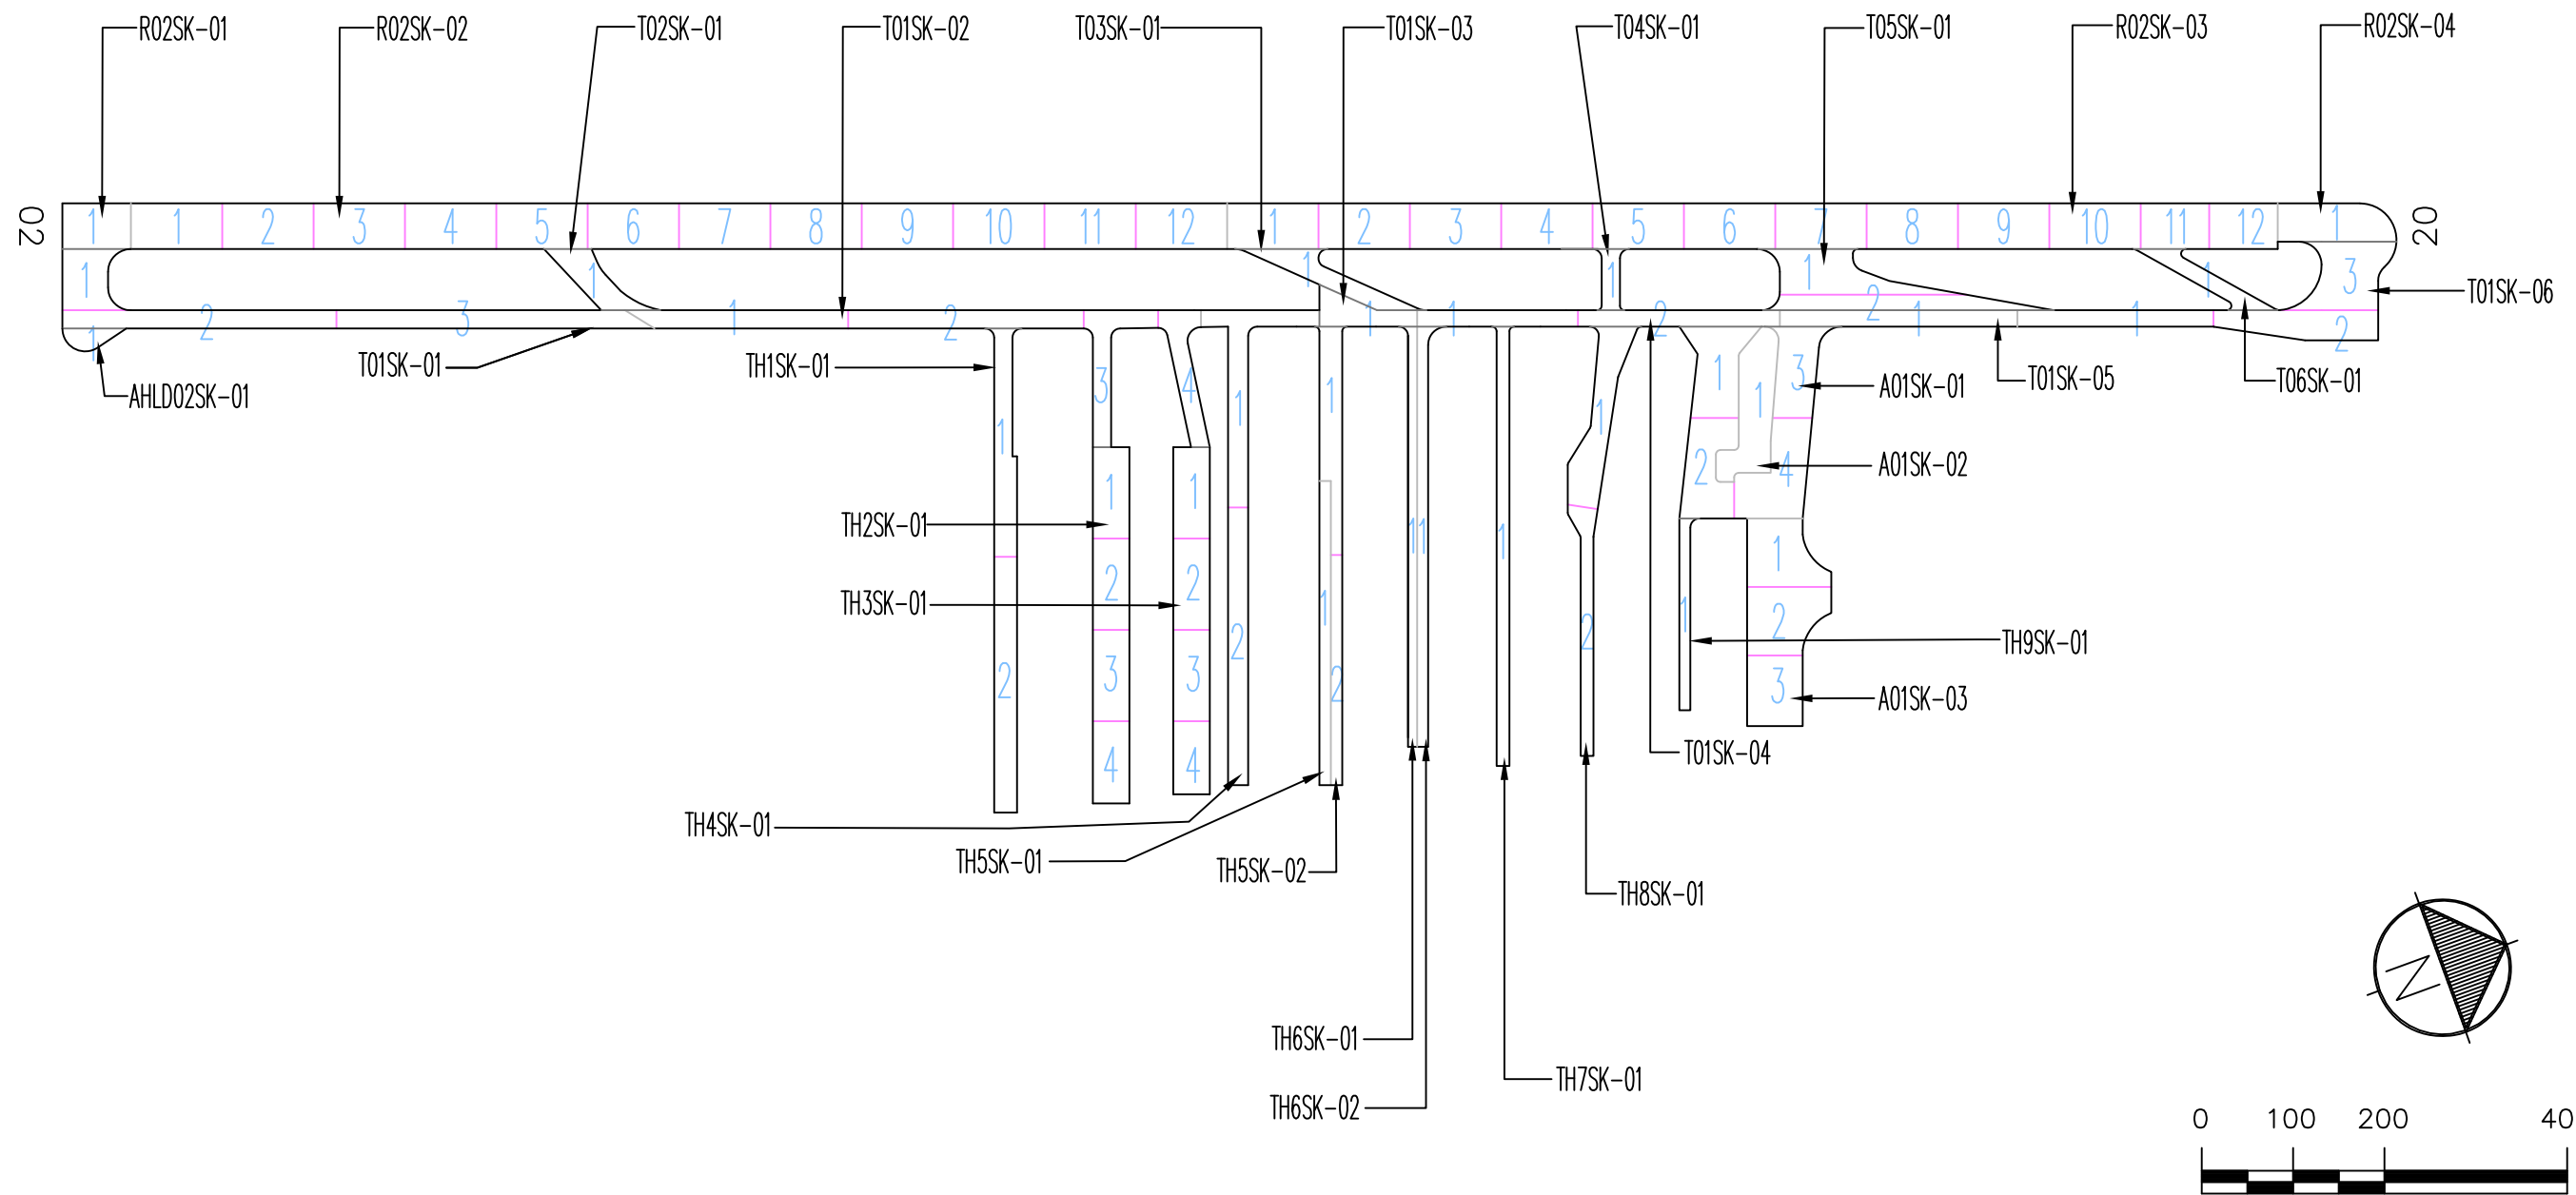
Pavement Branch, Section and Sample Unit Layout.
